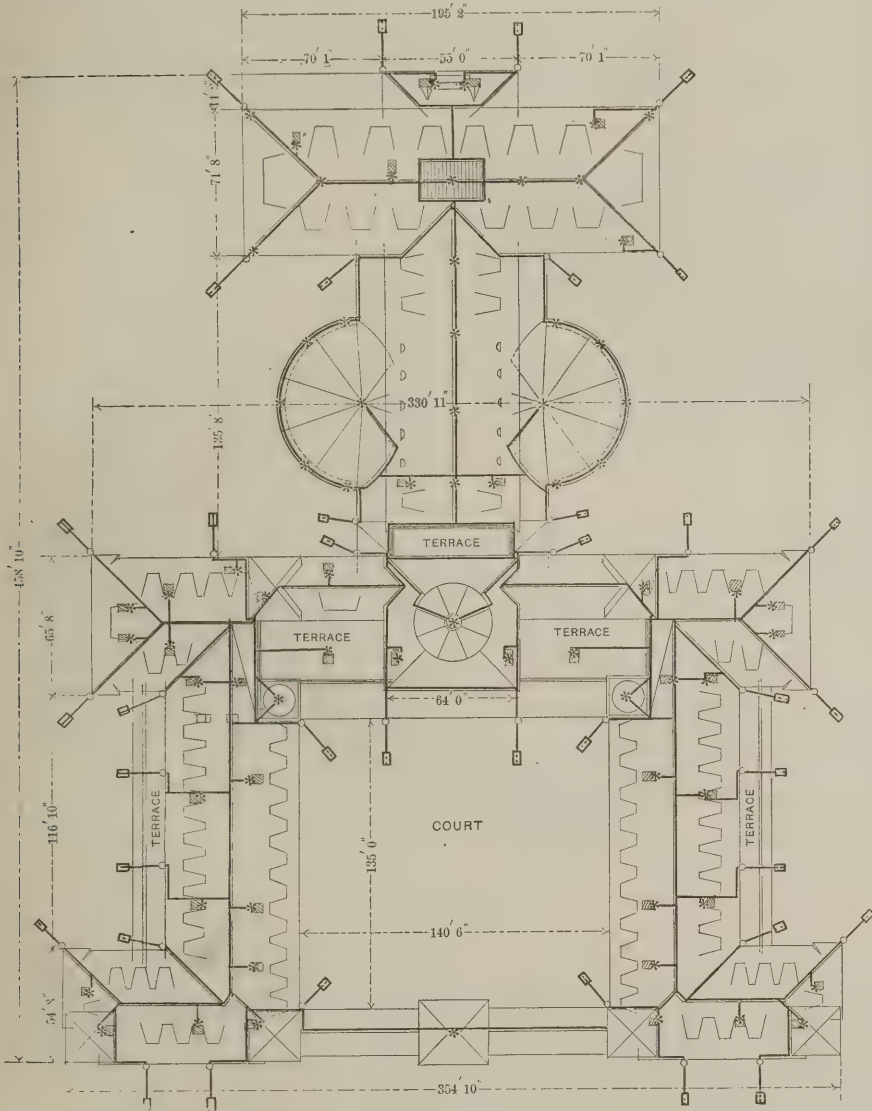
General Roof Plan of Ponce de Leon Hotel, St. Augustine, Showing Lightning Rod System.
